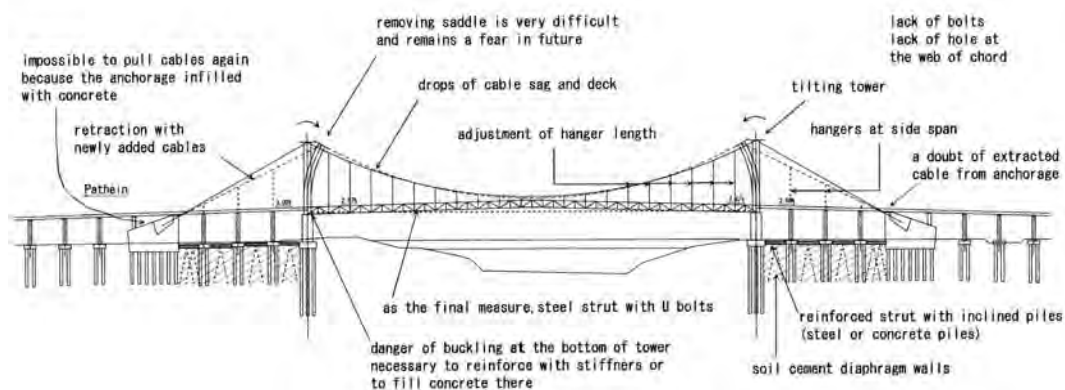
Troubles of Twantay Bridge and measures to reinforce substructure
